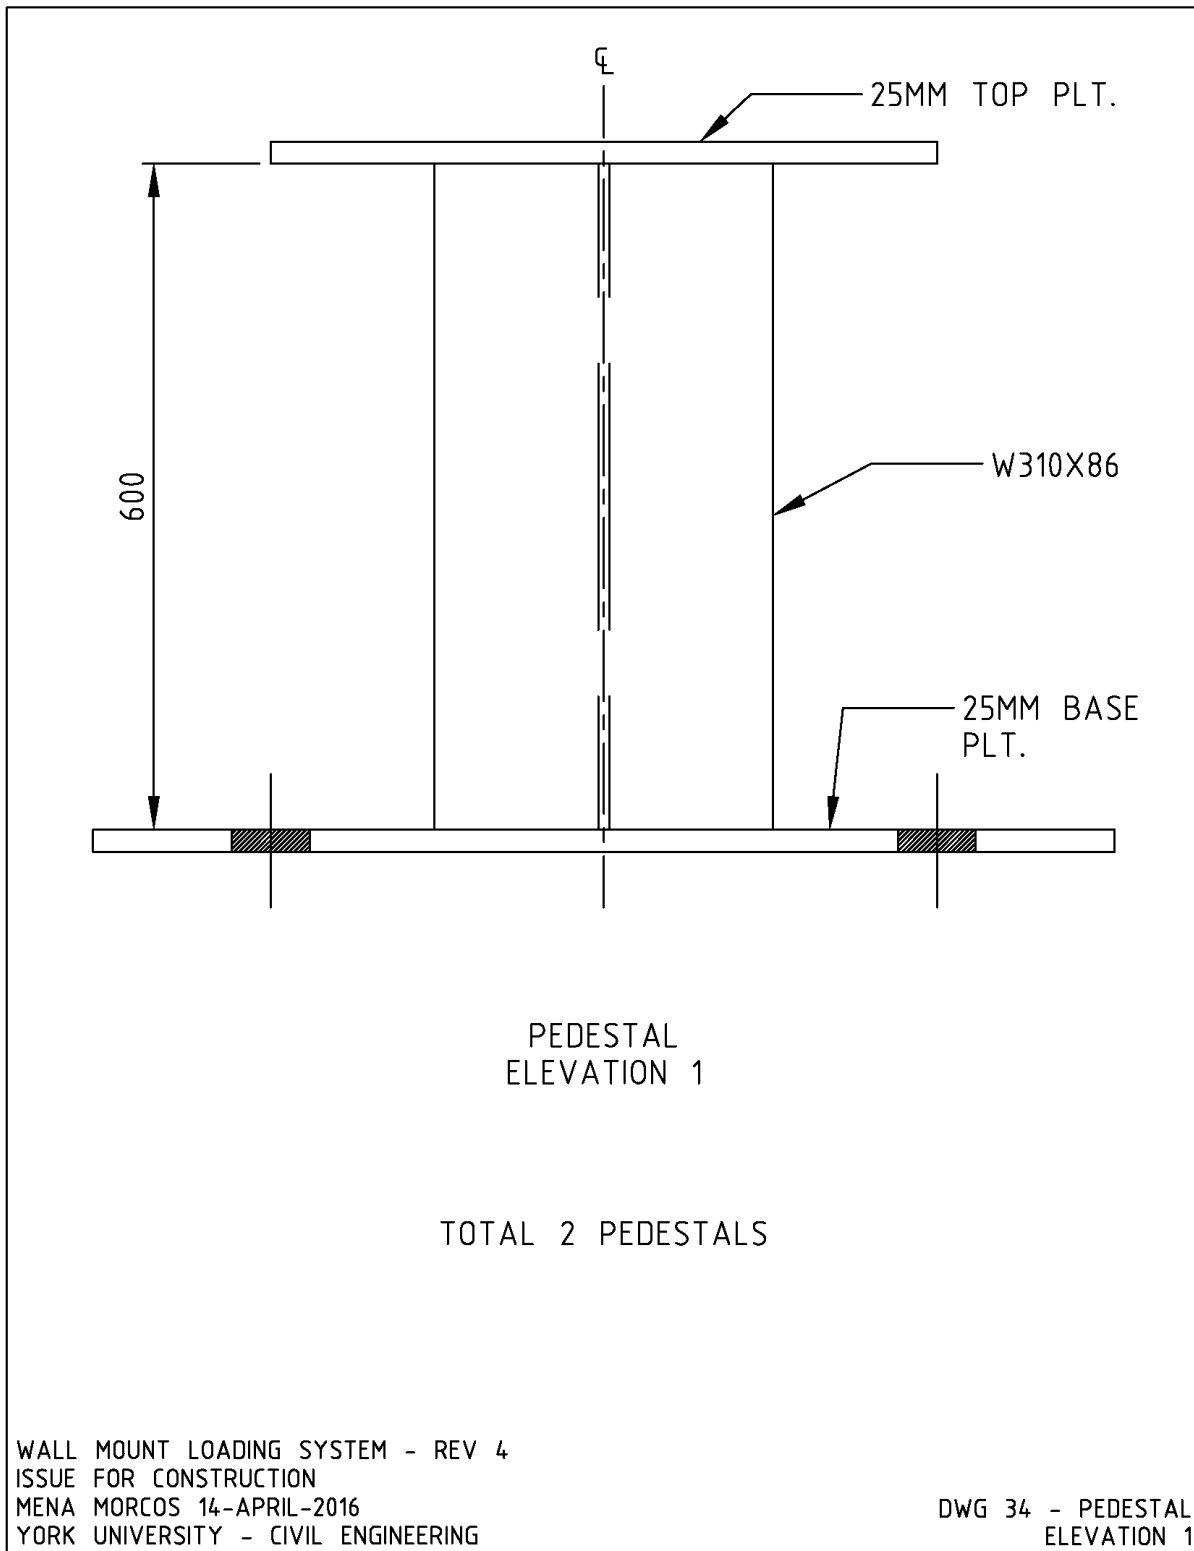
Wall mount loading system design and fabrication drawing – Drawing 34.
